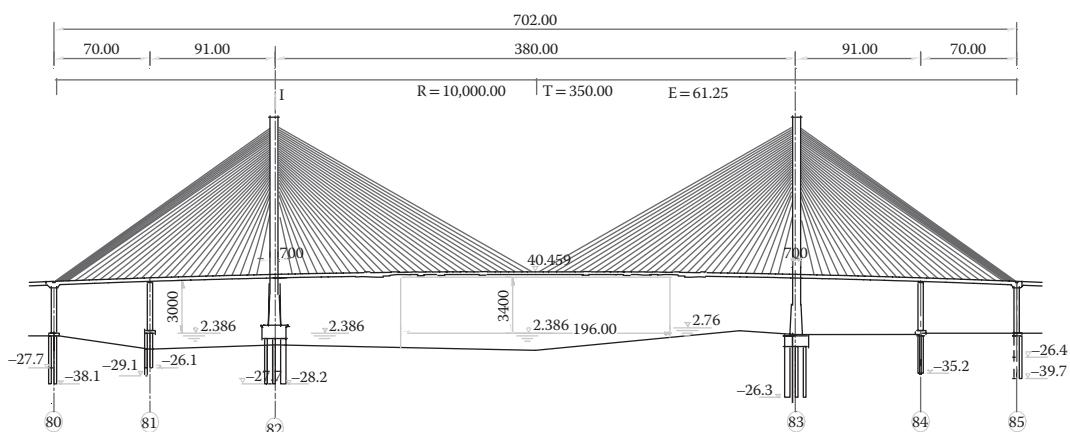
Elevation view of the Panyu cable-stayed bridge.
